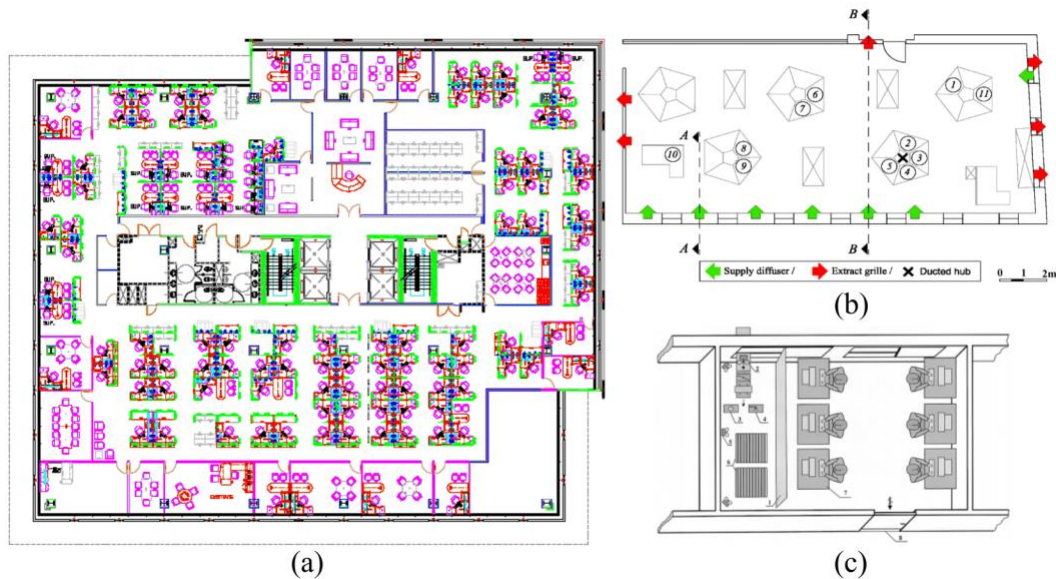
Typical open-plan office layout: (a) partitioned cubicles [56]; (b) polygon workstations [57]; (c) individual table [58]
